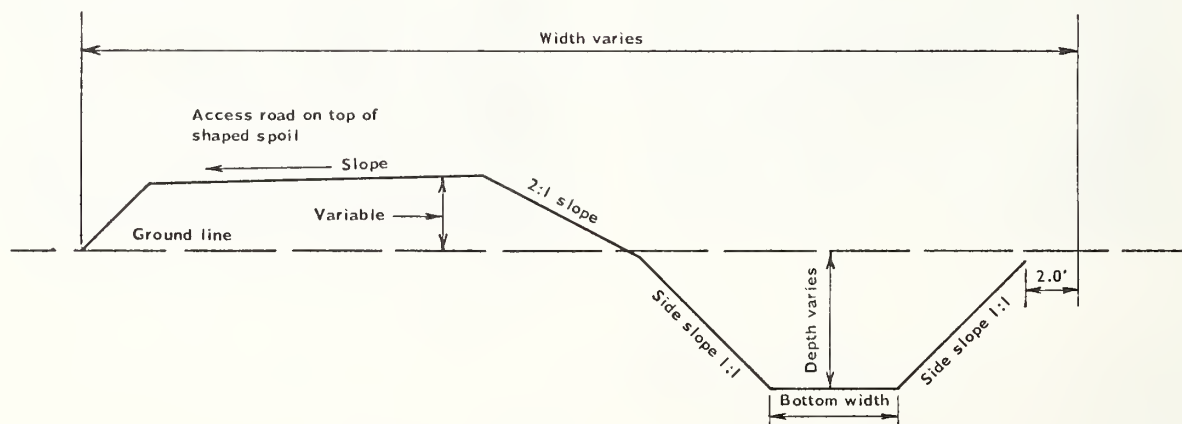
Typical Main Ditch Cross-Section Showing Basis For Determining Right-Of-Way Width
